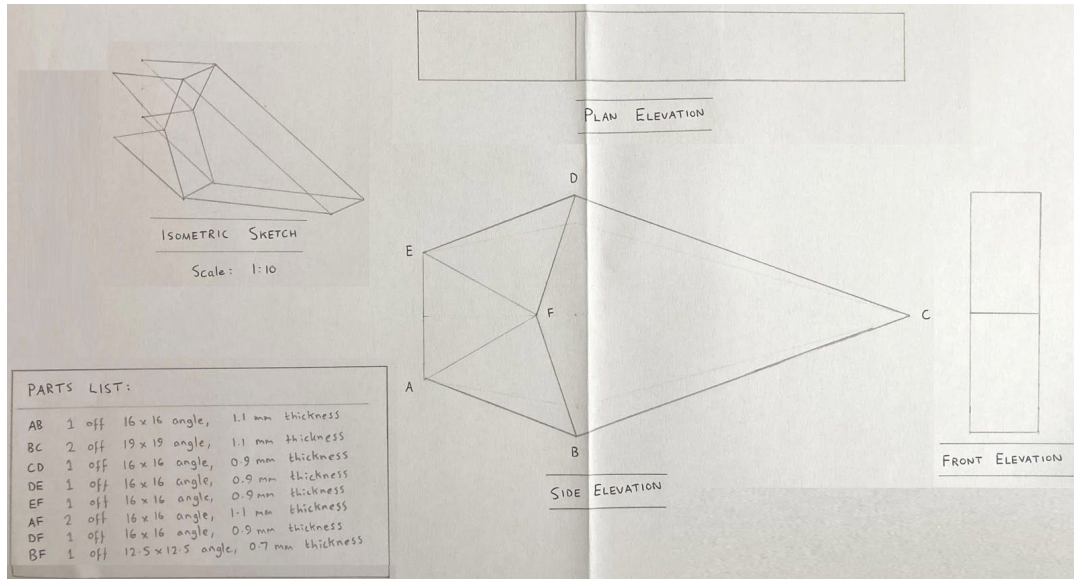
Drawing of plane section of truss and parts list. Cropped from original drawing.
